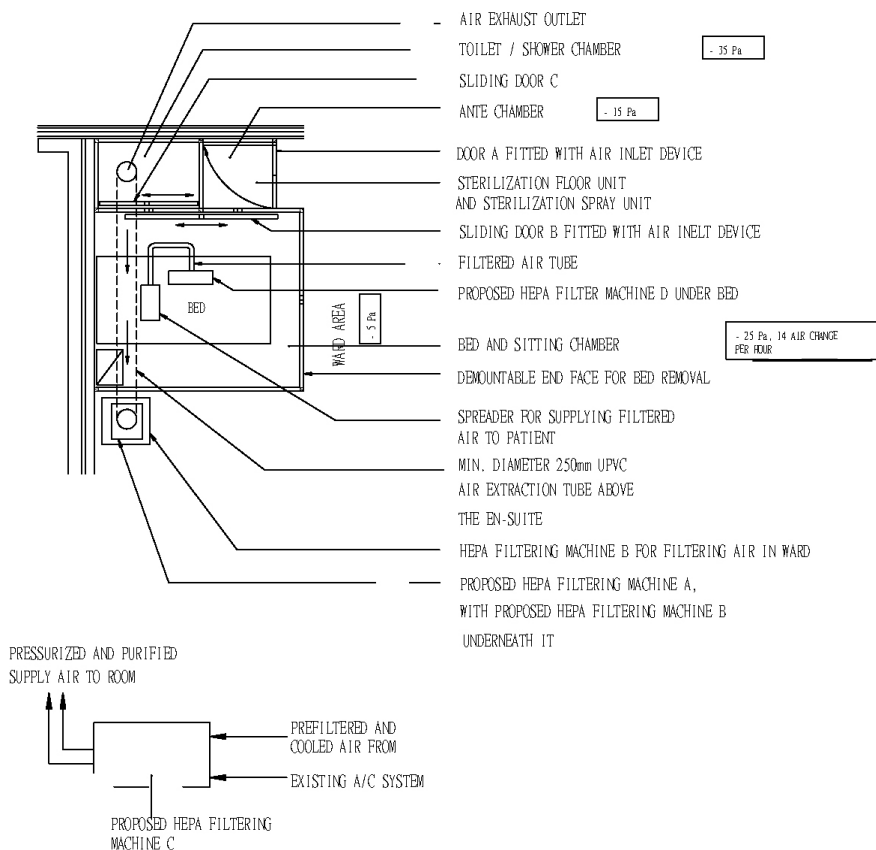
PROPOSED ISOLATION MINI-EN-SUITE,
